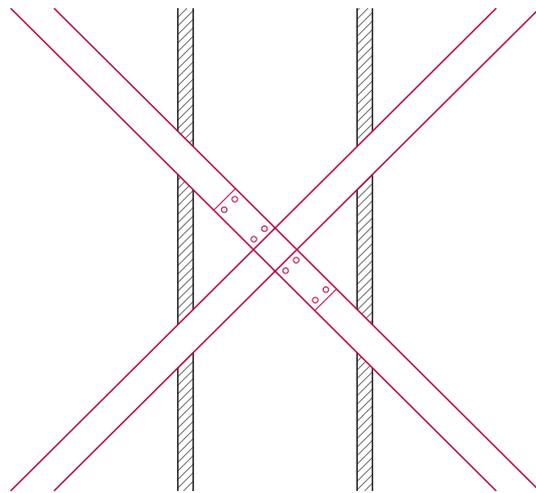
Diagonal rafter bracing – narrow fronted roofs
